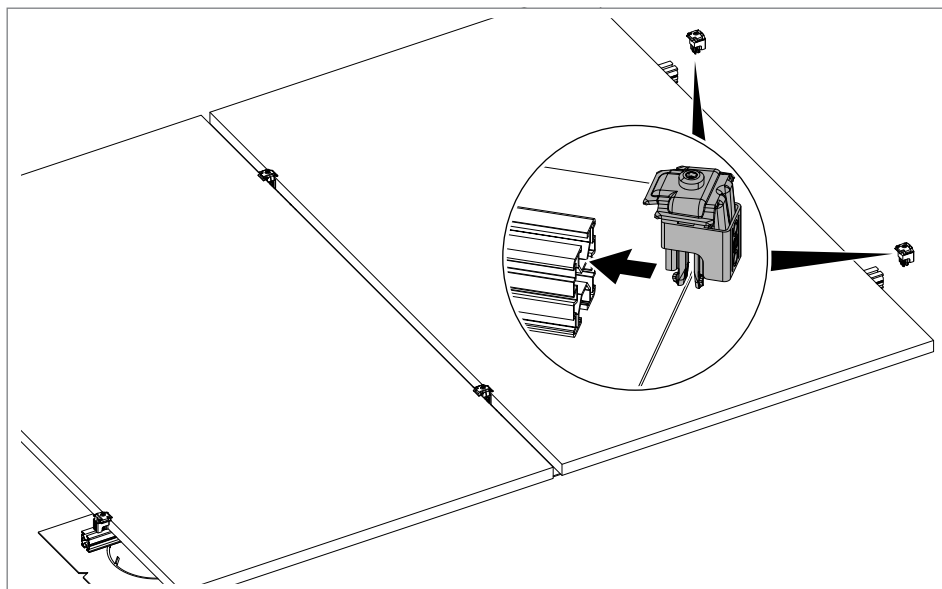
Screwing in the universal clamp as a intermediate clamp
